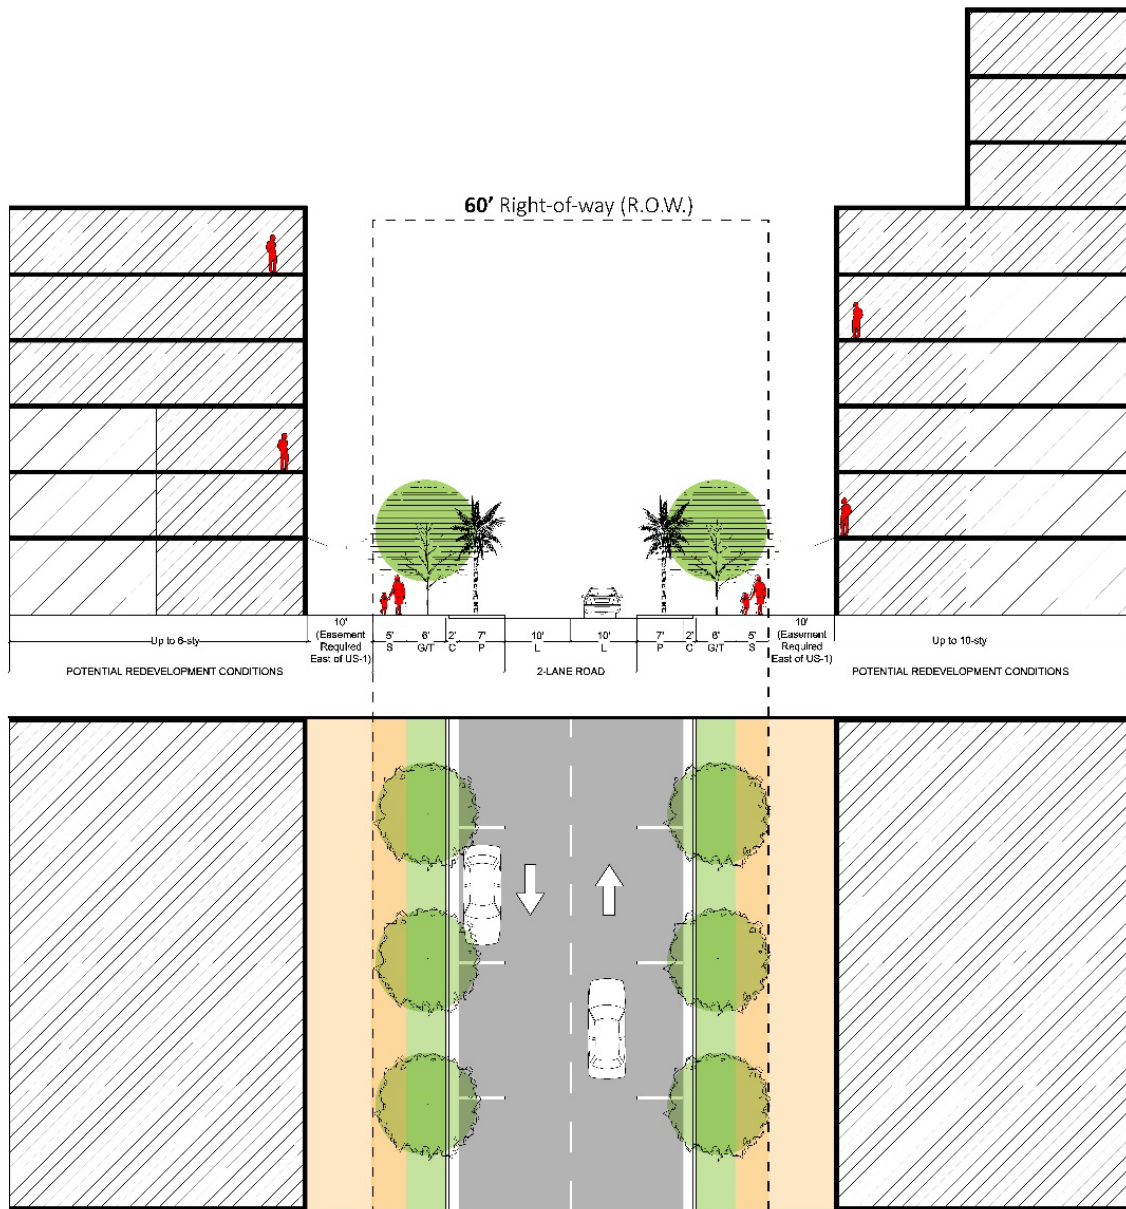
F.9: Tertiary Streets with Parking, Both Sides Street Design
